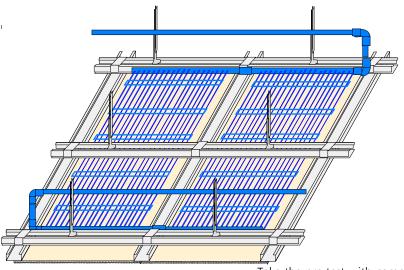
Arrangement of the BEKA mats on the dry-built ceiling with insulating boards, connected through flexible hoses.
